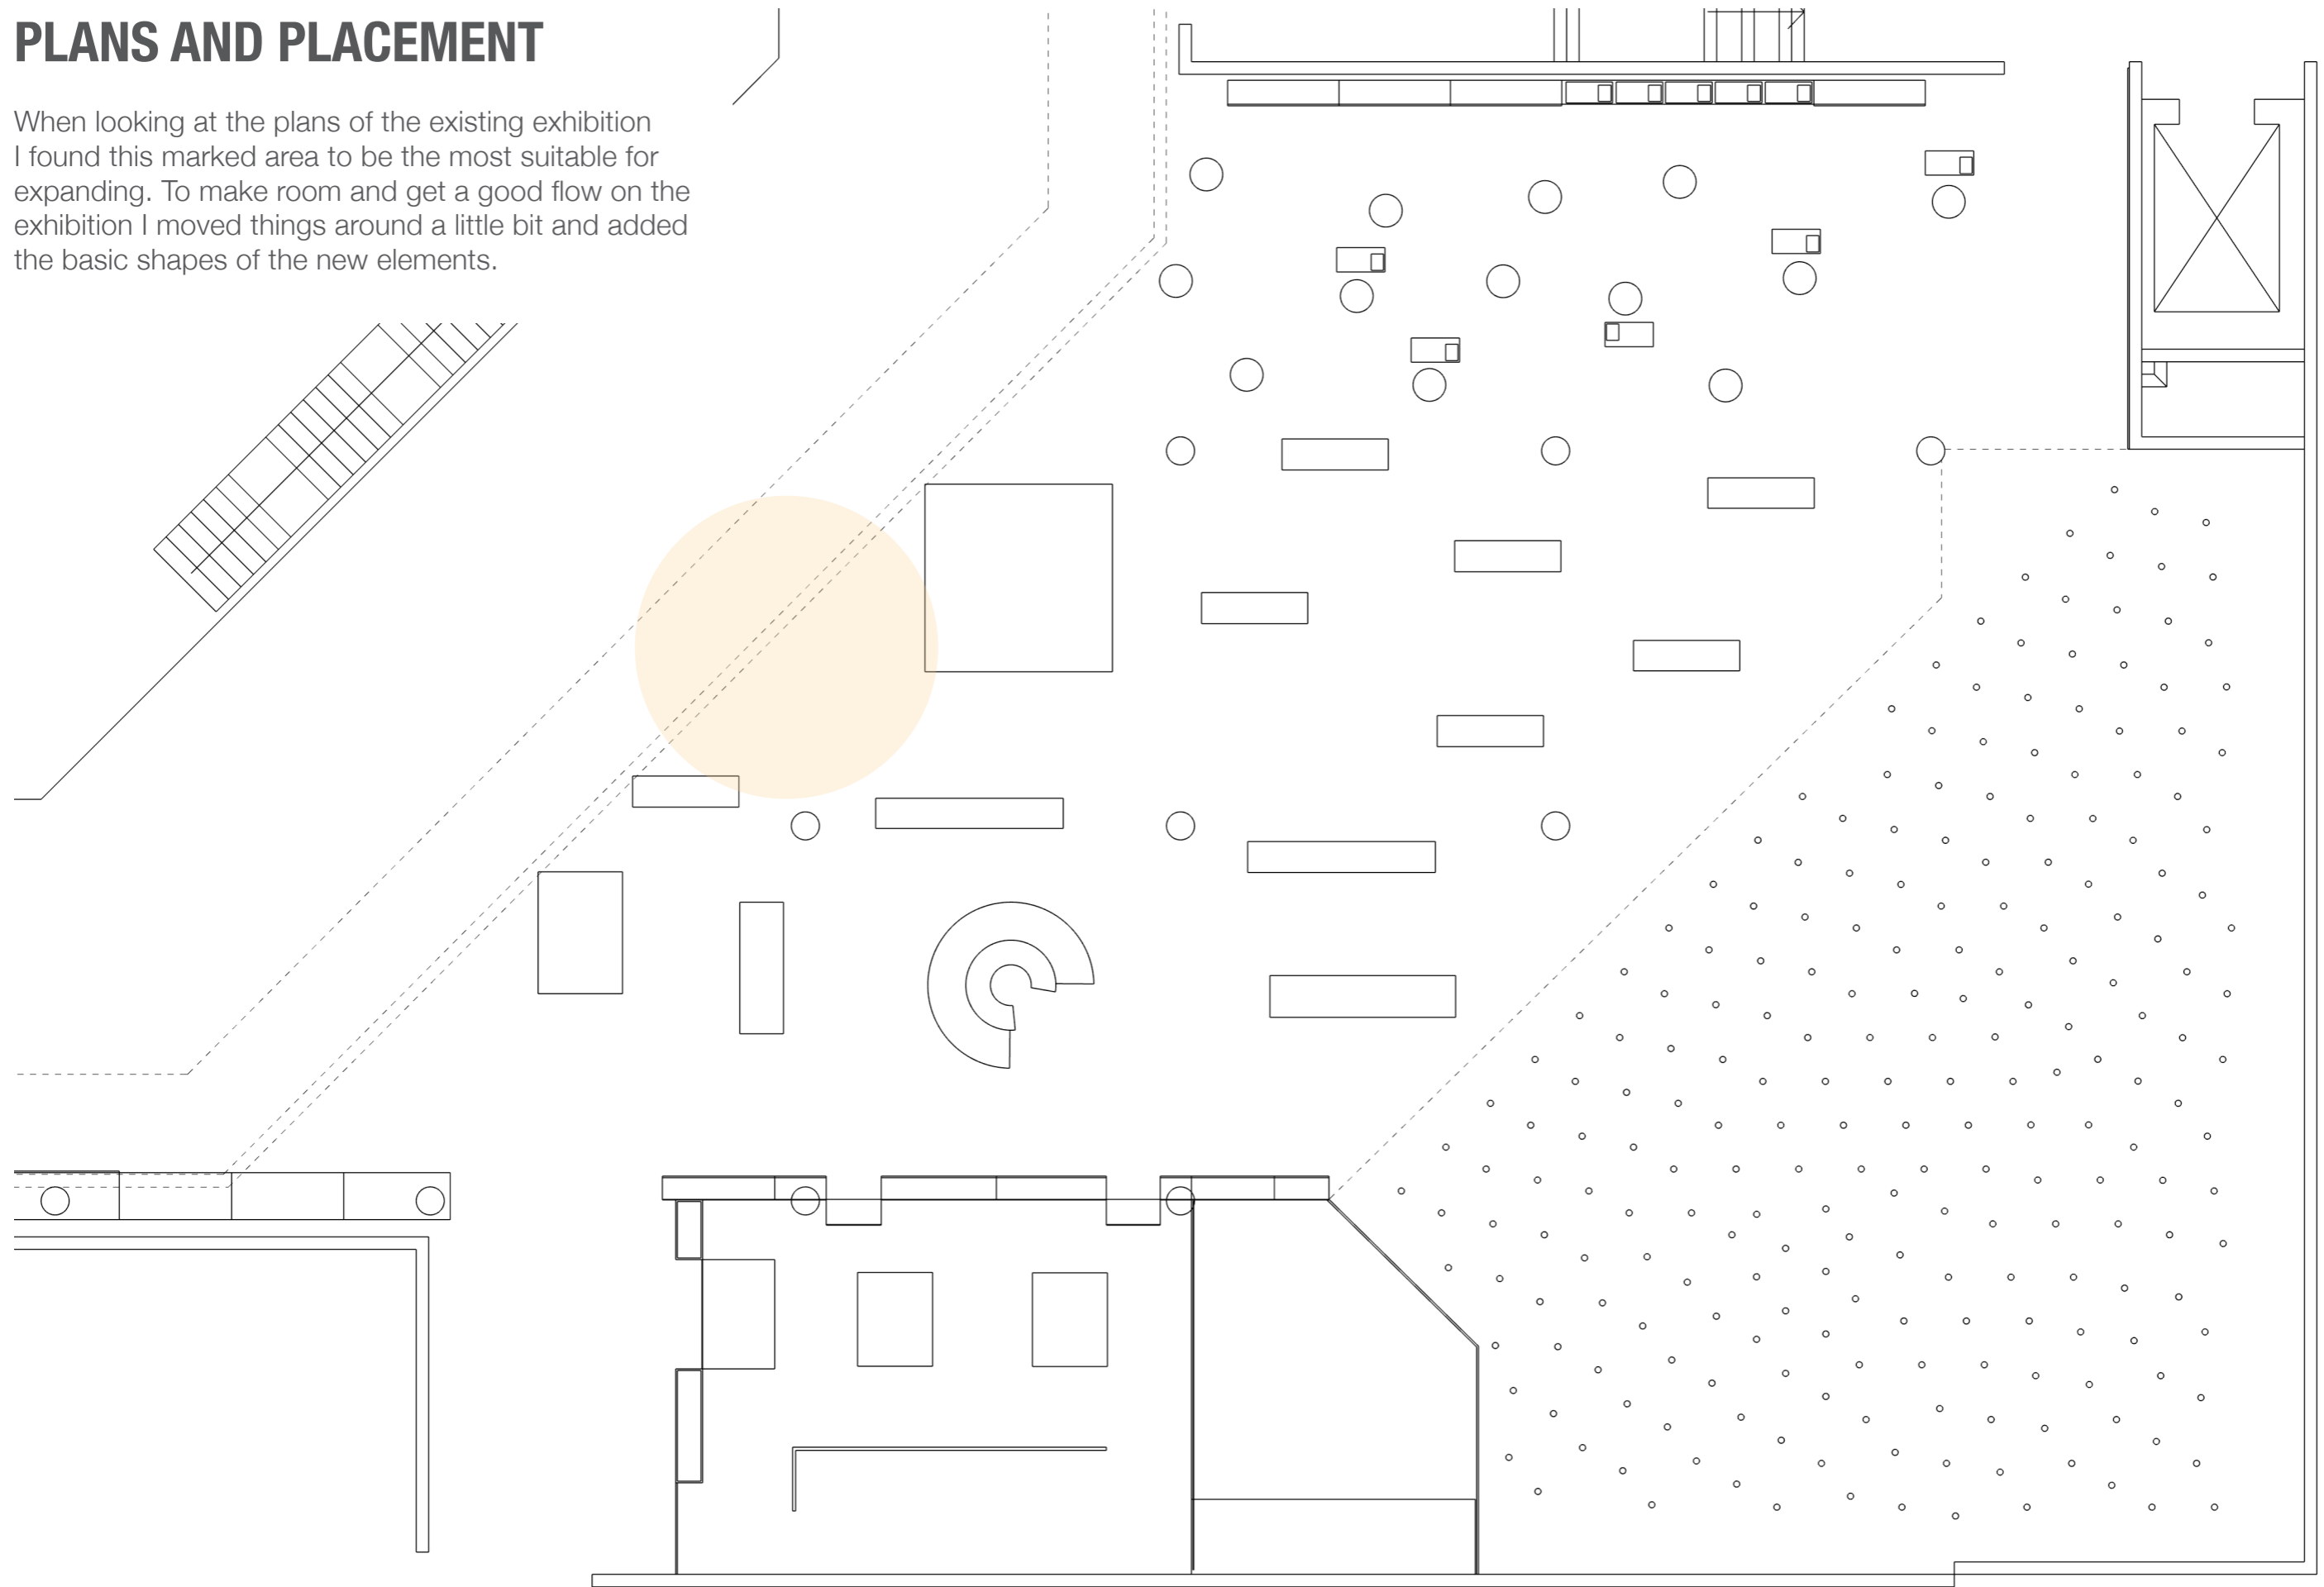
PLAN OF EXISTING EXHIBITION, 1:100
